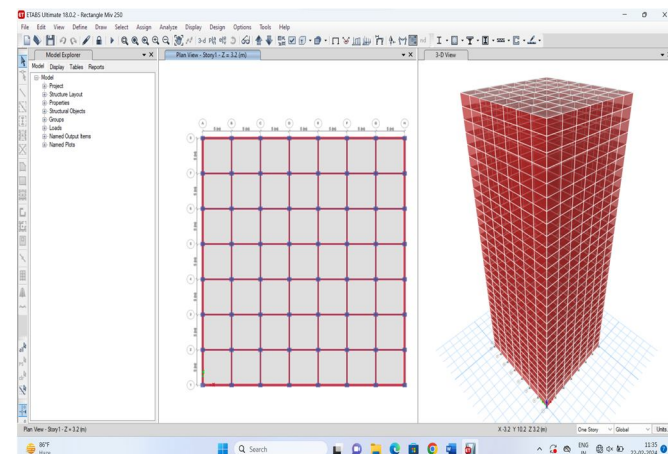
Plan and 3D view of rectangular shape MIVAN structure
